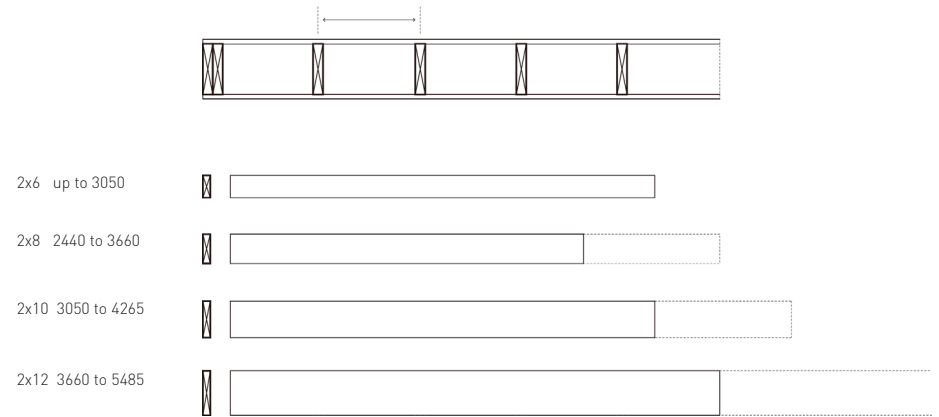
Wood joists cross section & Span ranges, redrawn by author (Ching, 2014)
